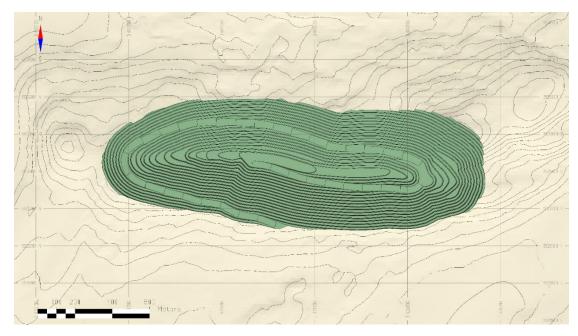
Mont Sorcier Pit Design (Plan View)
